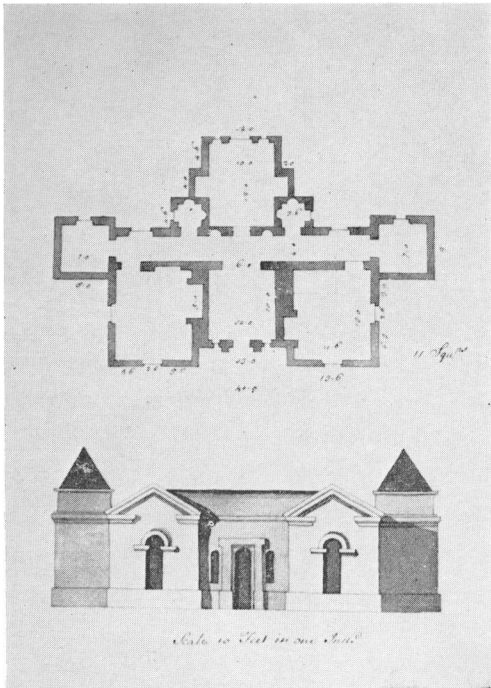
Plan and elevation of a small one-storey house* [101]
